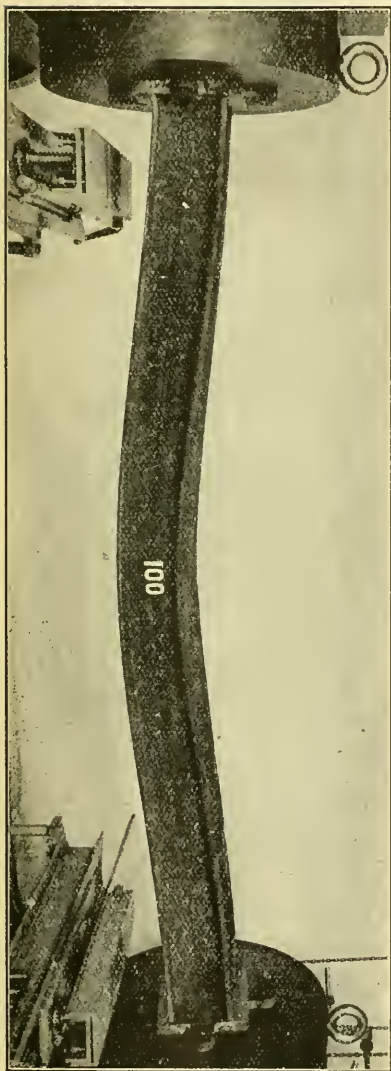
Z-BAR COLUMN. TYPE 8. HEAVY SECTION.
